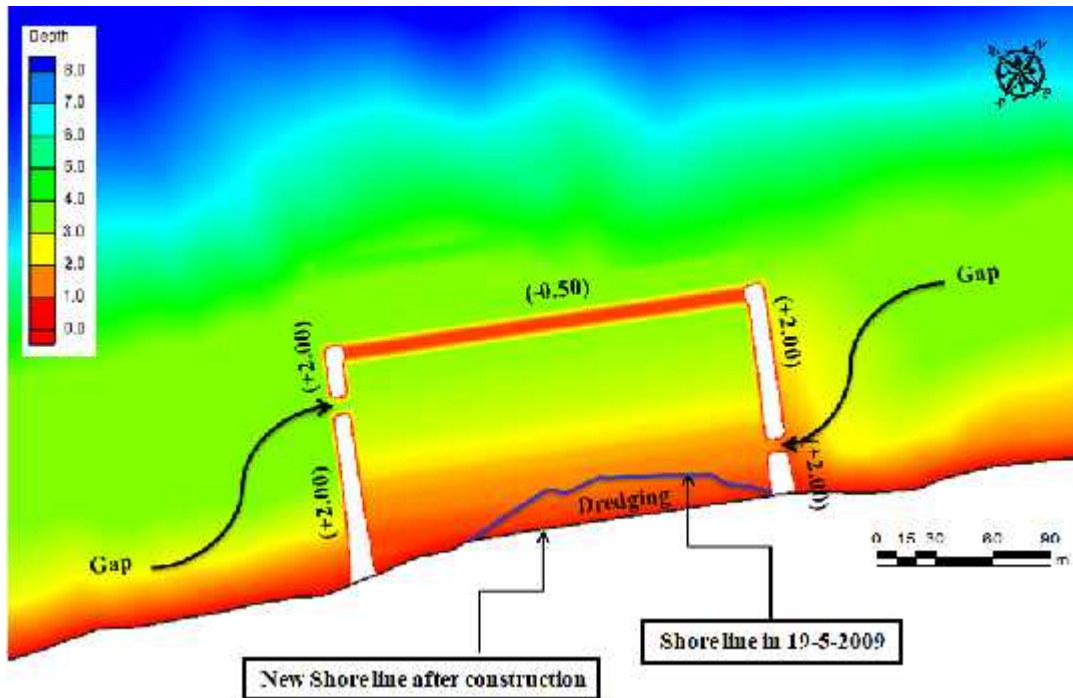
Layout of structures and sea bed levels for alternative (03)
